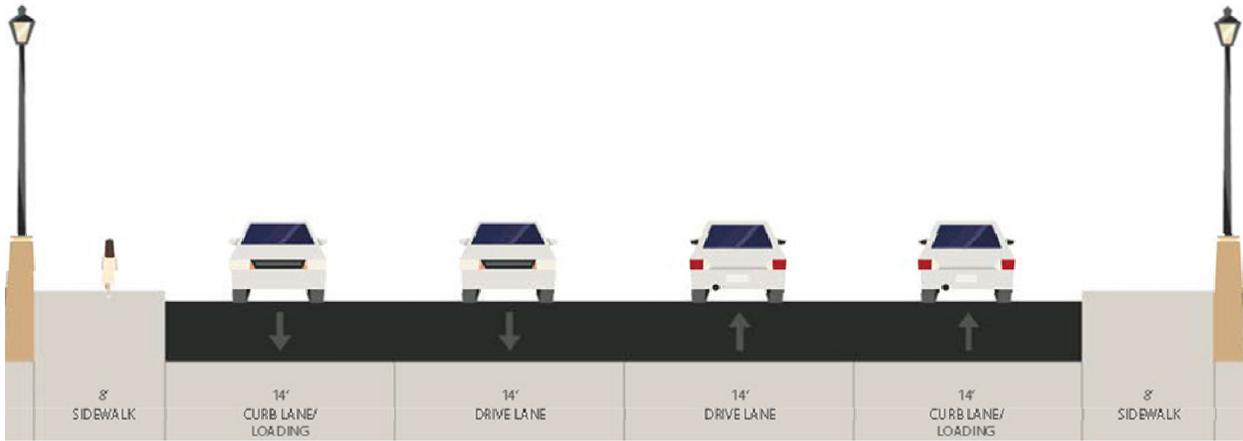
EXISTING SECTION OF ELM STREET BRIDGE
